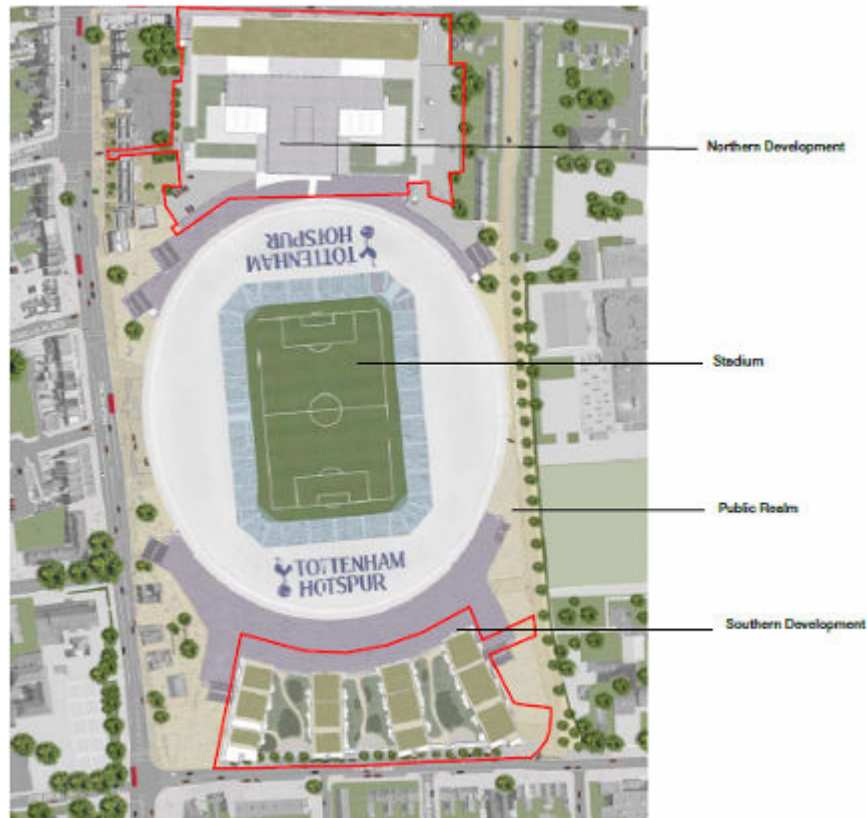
Site plan with application sites edged in bold. Source: Applicant's Design & Access Statement (Dec. 2011).
